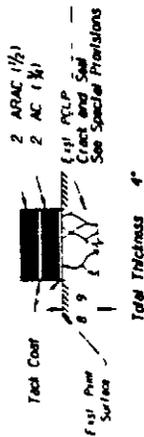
PAVEMENT STRUCTURAL SECTIONS
